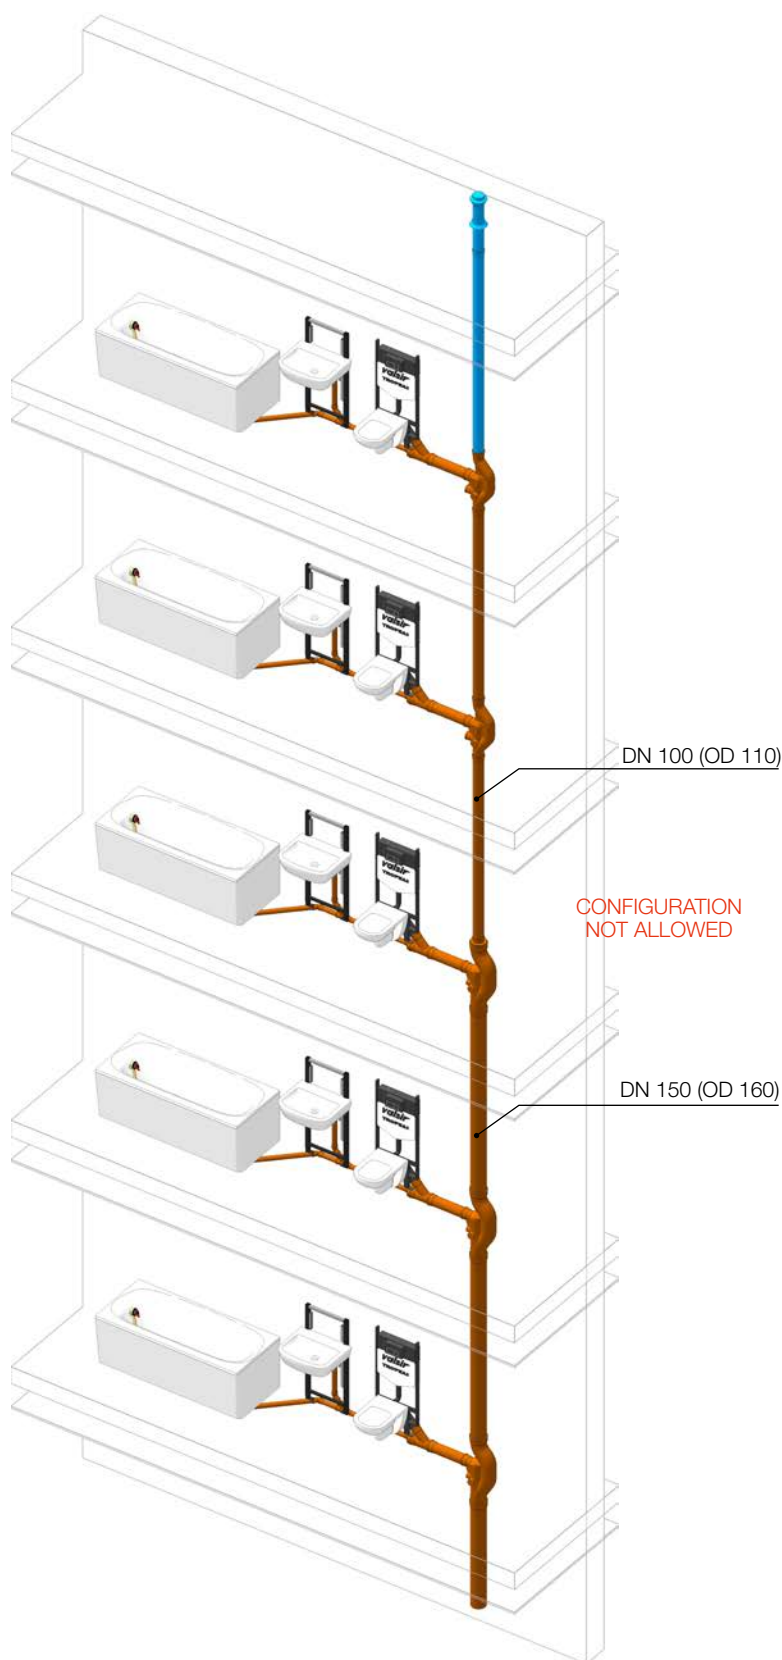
Ventilation branch fittings system without pressure relief loop where the collector is ceiling mounted to the basement floor or to the floor slab where the direction change is located.
